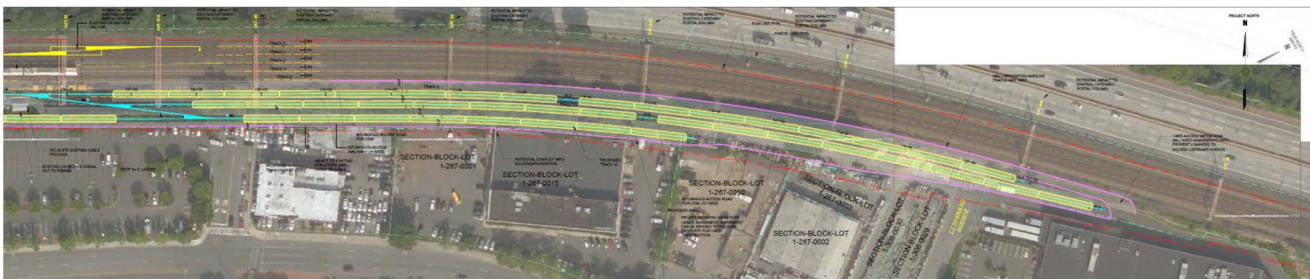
Proposed Expansion - East Yard, 2525 Palmer Avenue, Lisenard Ave./ Stop and Shop
